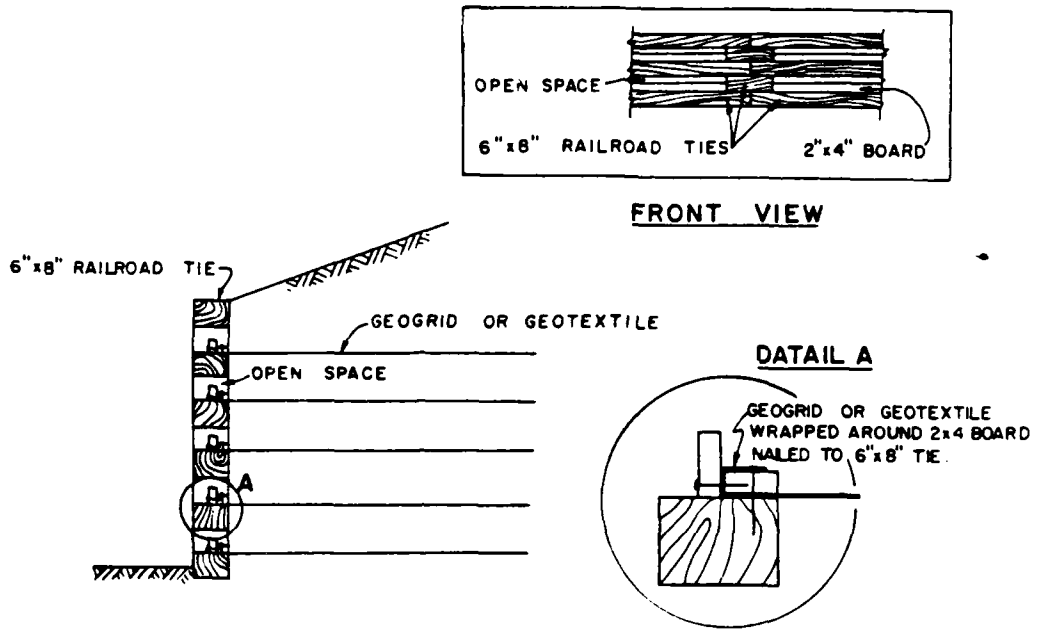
Section of timber faced earth reinforced wall (Barrett (1985))
